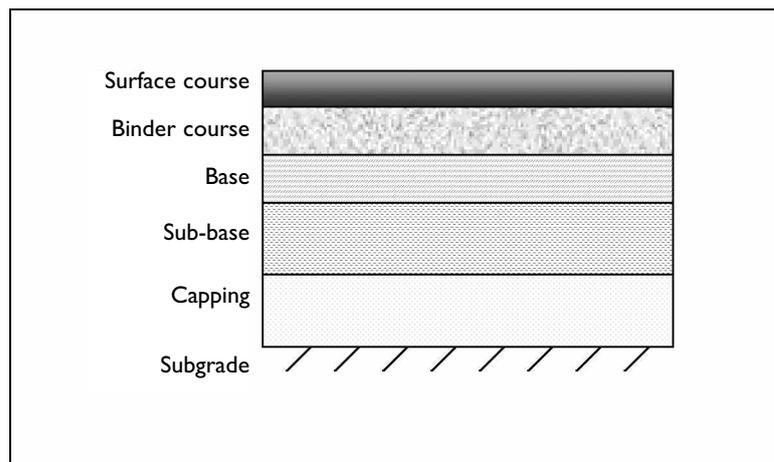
CROSS-SECTION OF A TYPICAL CARRIAGEWAY CONSTRUCTION
